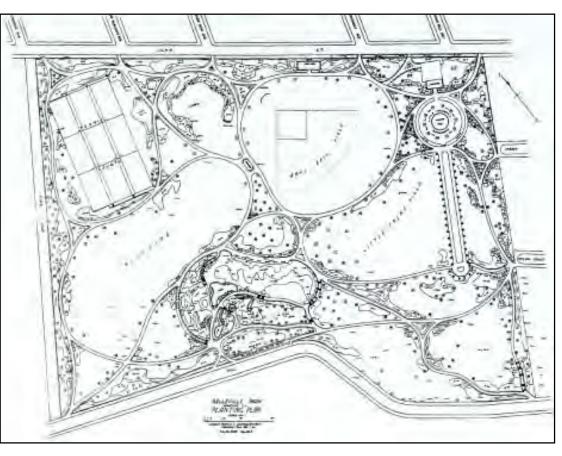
Planting Plan for Belleville Park, Plan #2148-8, 7 February 1917. Source: ONHS.
